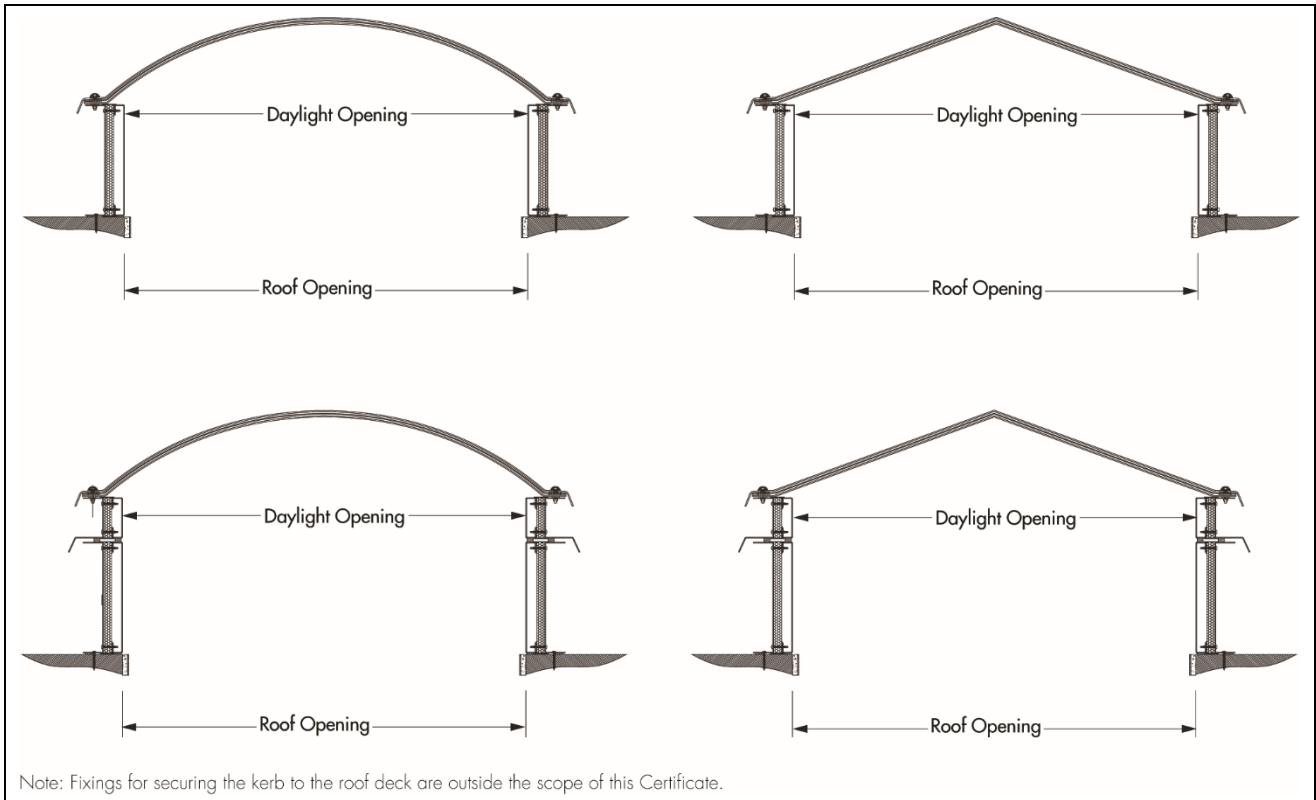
Typical Bauder Modular Rooflights with X3 Kerbs fitted with Bauder Security frame
